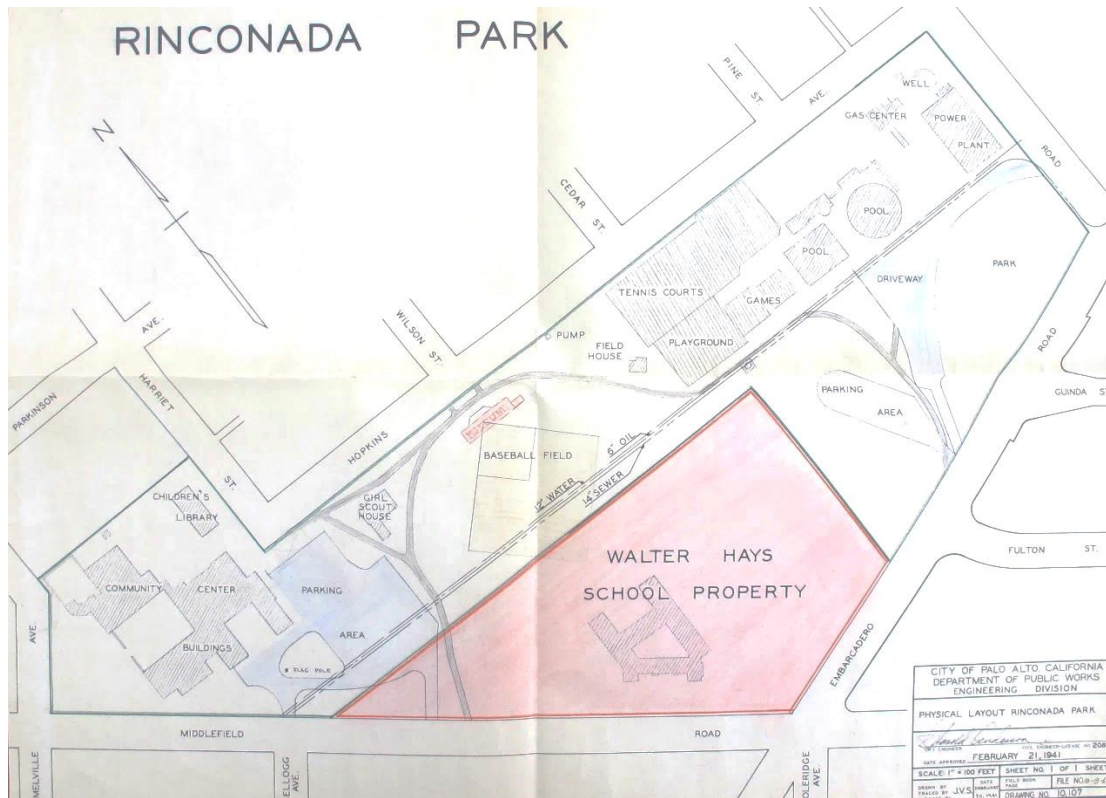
Palo Alto Department of Public Works site plan of “Physical Layout Rinconada Park,” 21 February 1941.
